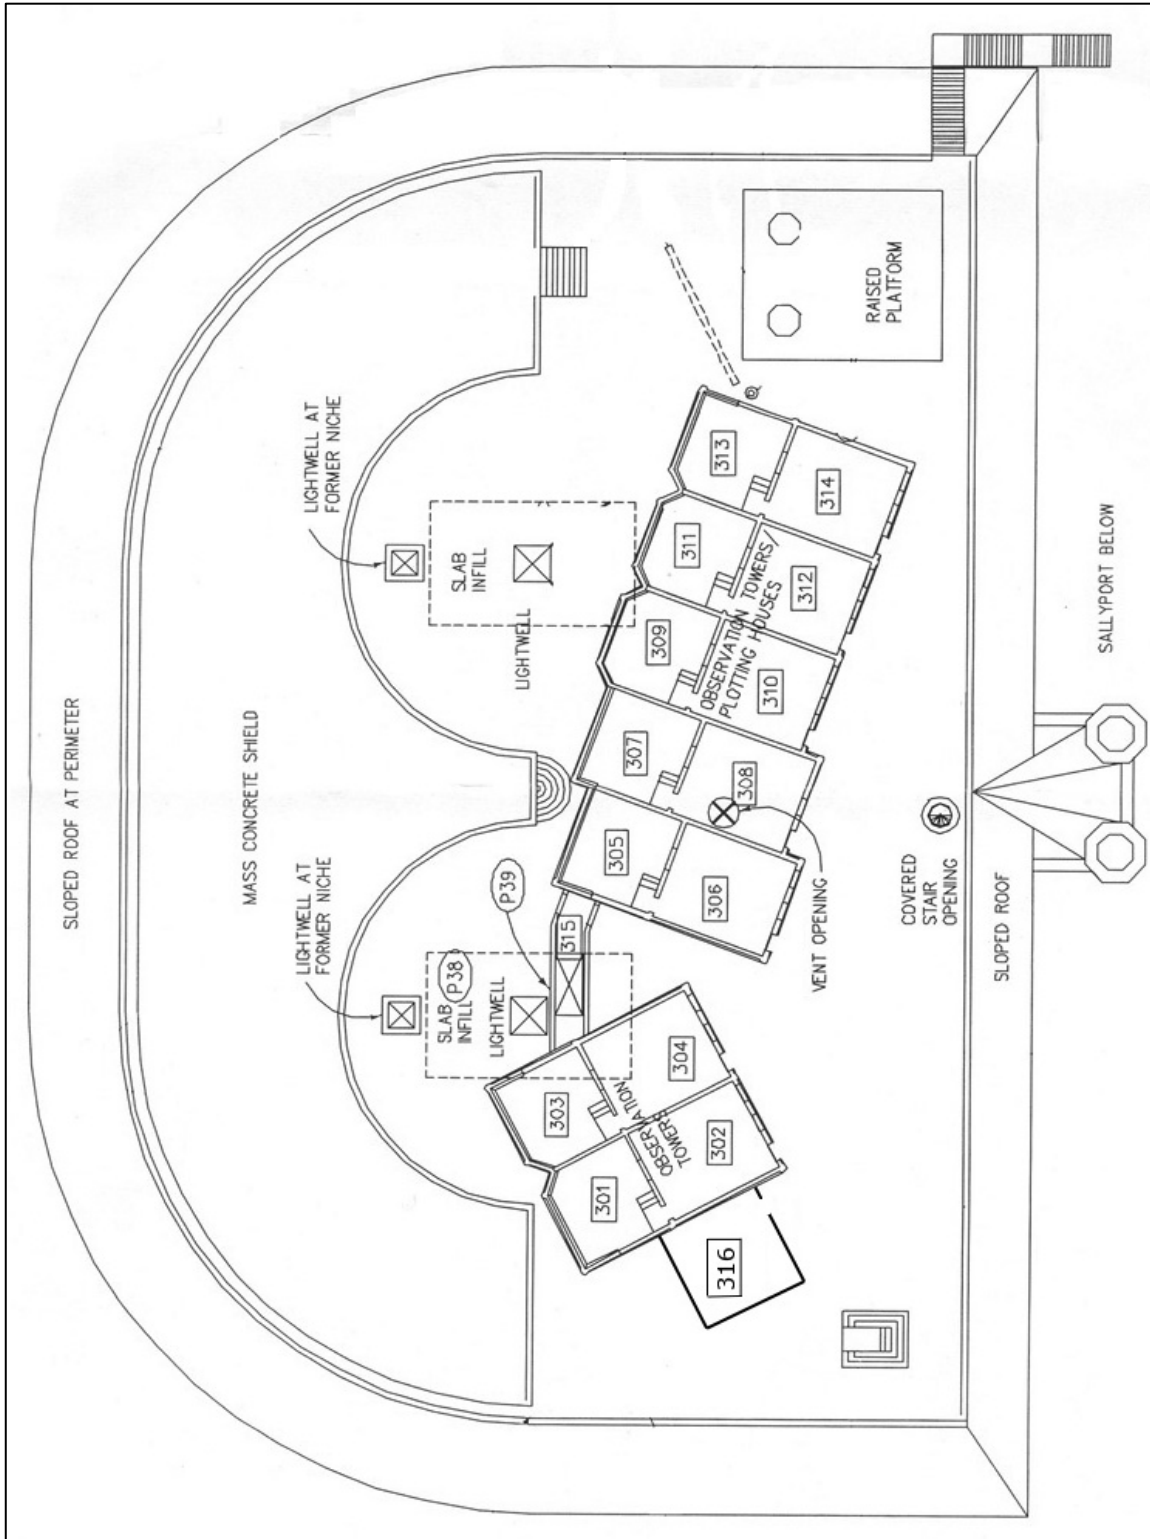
Battery Potter, terreplein, superior slope, and fire-control stations floor plan with room numbers. Not to scale.
